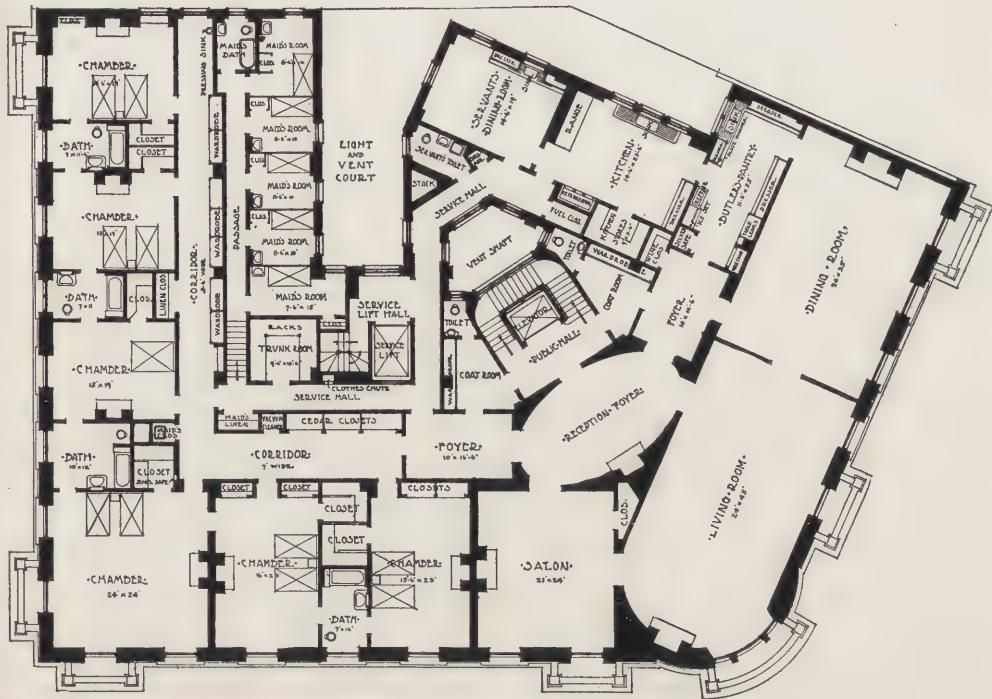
TYPICAL FLOOR PLAN—APARTMENT HOUSE AT 1785 MASSACHUSETTS AVENUE,
